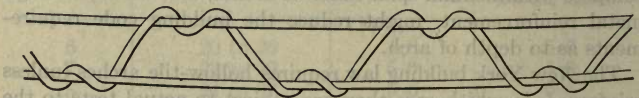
Wire Truss Reinforcement, "New York" Arch.
